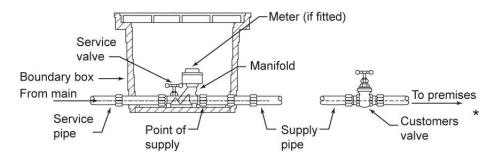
Examples of fitting details showing point of supply 7a Domestic unmetered supply
